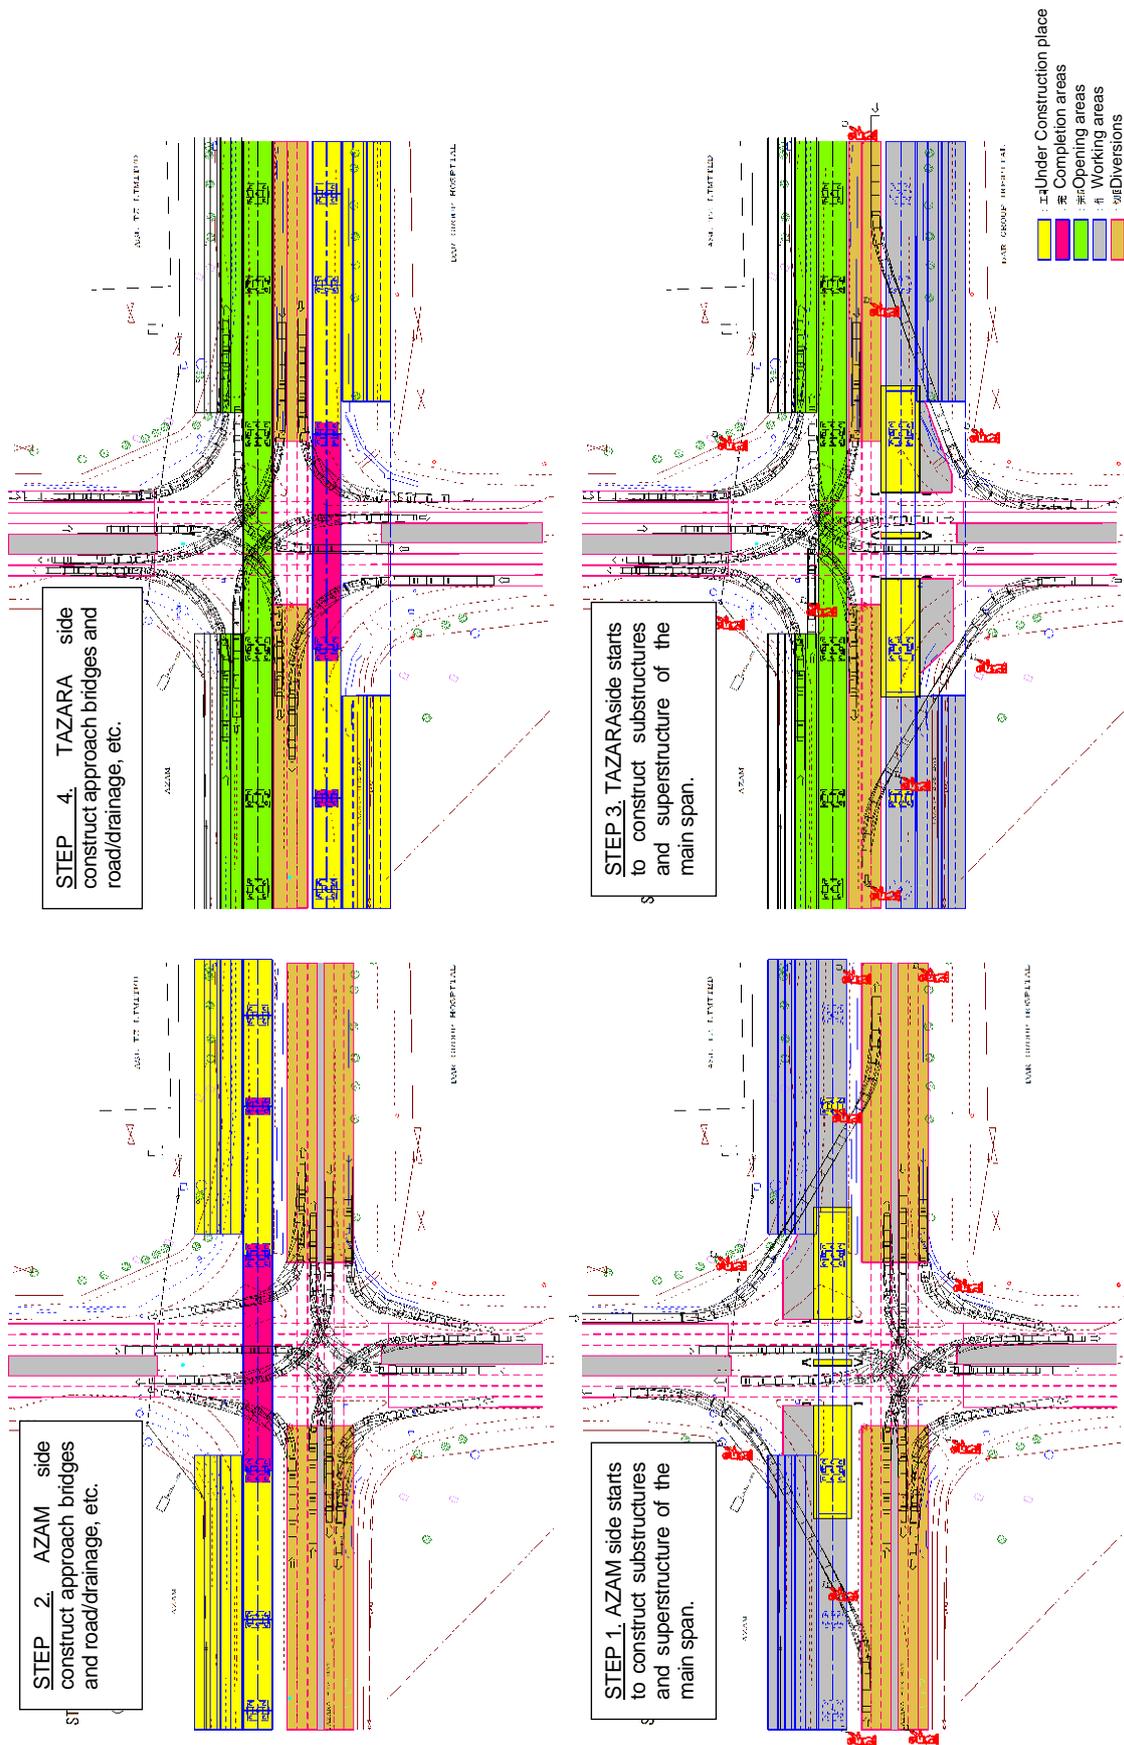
Construction Steps of Main Bridge/Approach Bridge and Road
